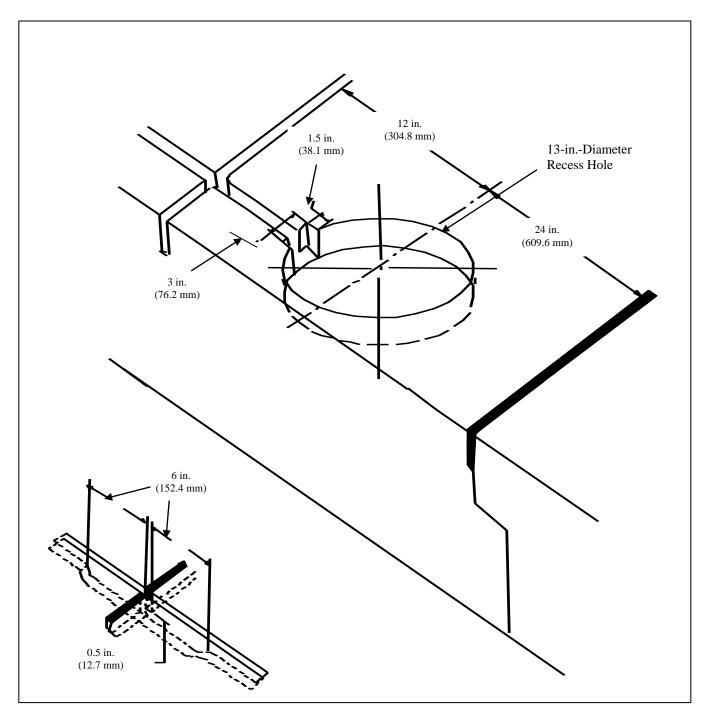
Preparing Pavement Recess and Wireways for Shallow Base Installation
